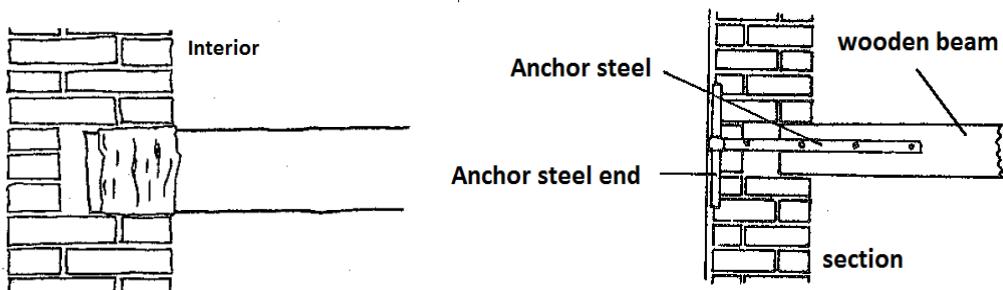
Left: Basic example of beam box, covered with birch bark or bituminous paper (Eriksson and Hansson, 1974). Right: Basic example of beam box, with anchor steel (Eriksson and Hansson, 1974).
